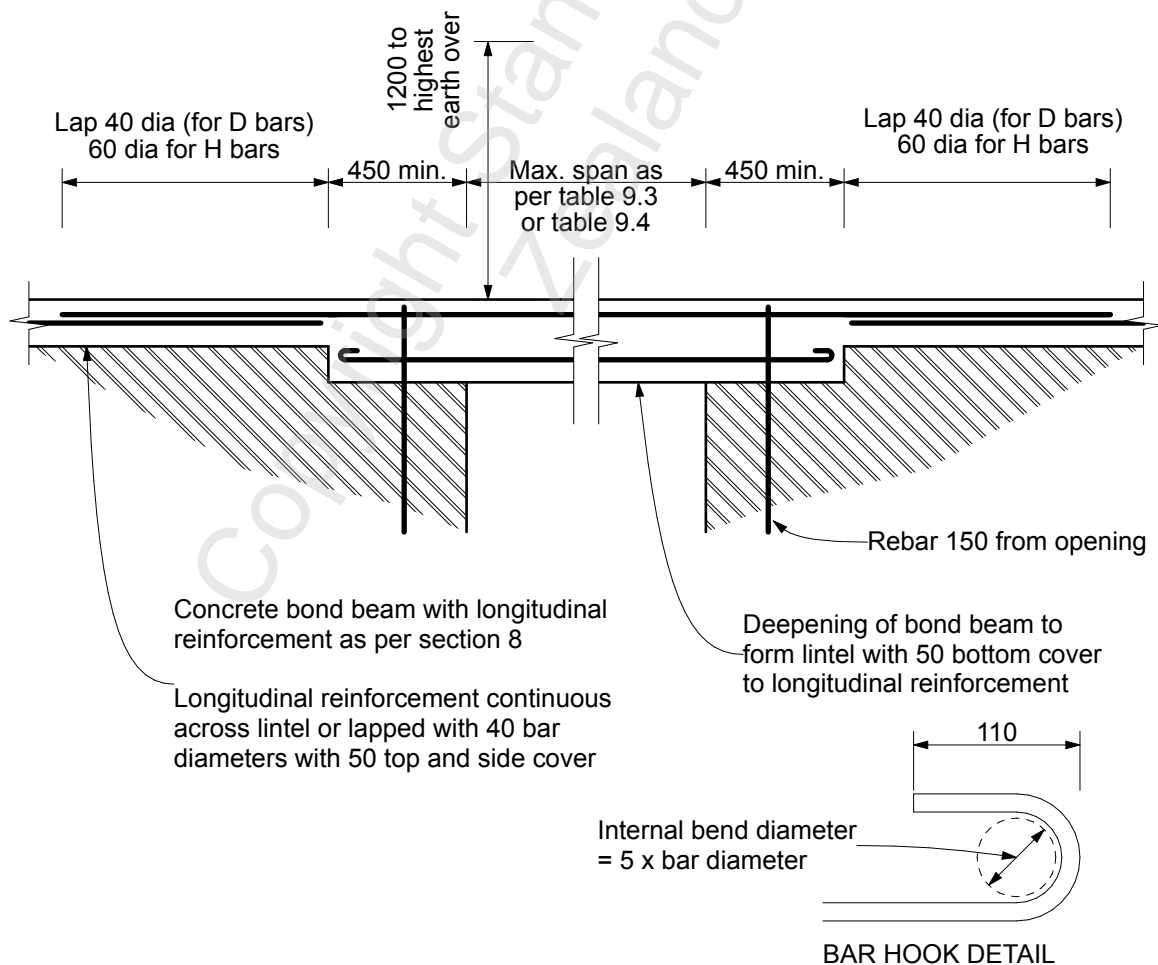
Concrete lintel general arrangement where lintel forms bond beam
